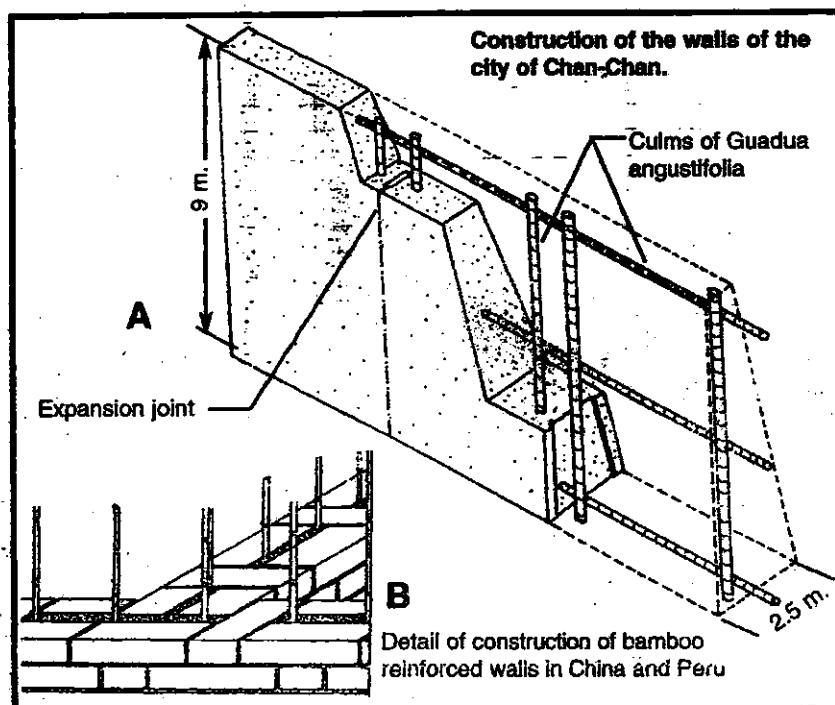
A. Detail of construction of the adobe wall of Chan Chan showing the bamboo reinforcement and the expansion joints. The reinforcement with bamboo gives stability to the walls during earthquakes. Since ancient times, the Chinese have reinforced the adobe walls of their houses with small diameter vertical and horizontal bamboos for the same purpose.
